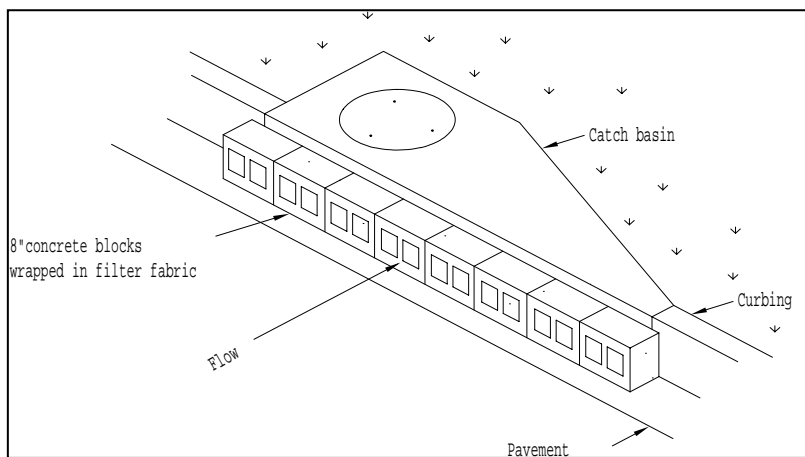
Curb Inlet Filter Installation Requirements
